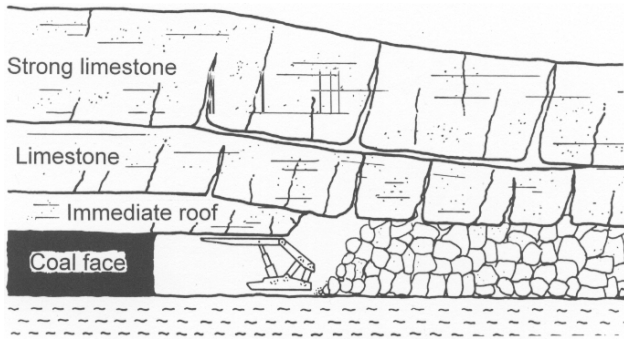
Vertical shield loading induced by deflection of main roof and weight of damaged immediate roof.
